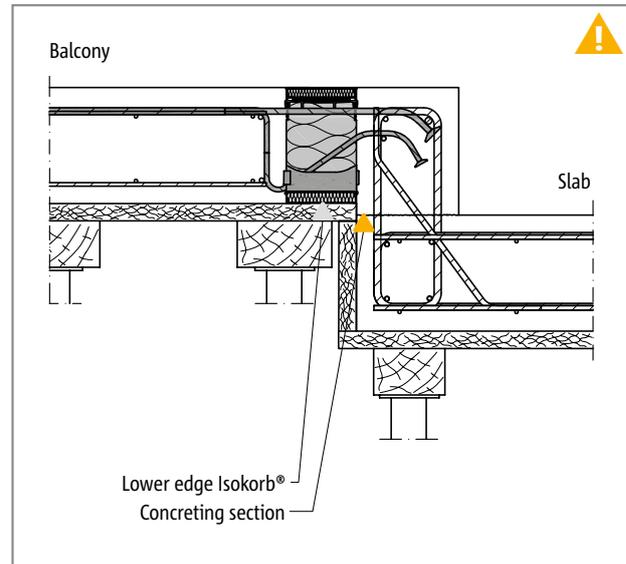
Schöck Isokorb® XT type K-O: In-situ concrete balcony with height offset upwards
